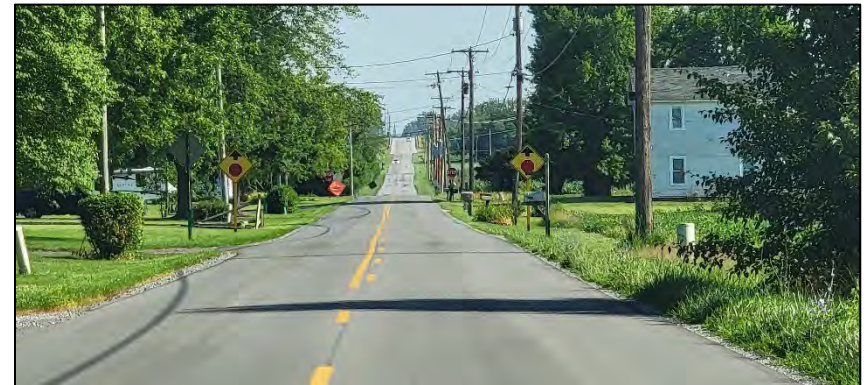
Dual Stop Ahead and Stop Signs on northbound McClain Road approaching Breese Road
